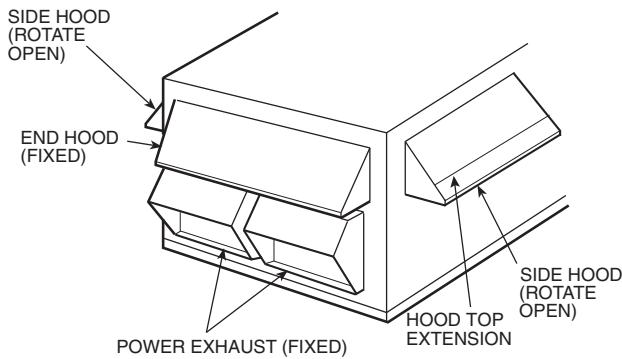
Outdoor Air Hood Installation (Sizes 030-050)
